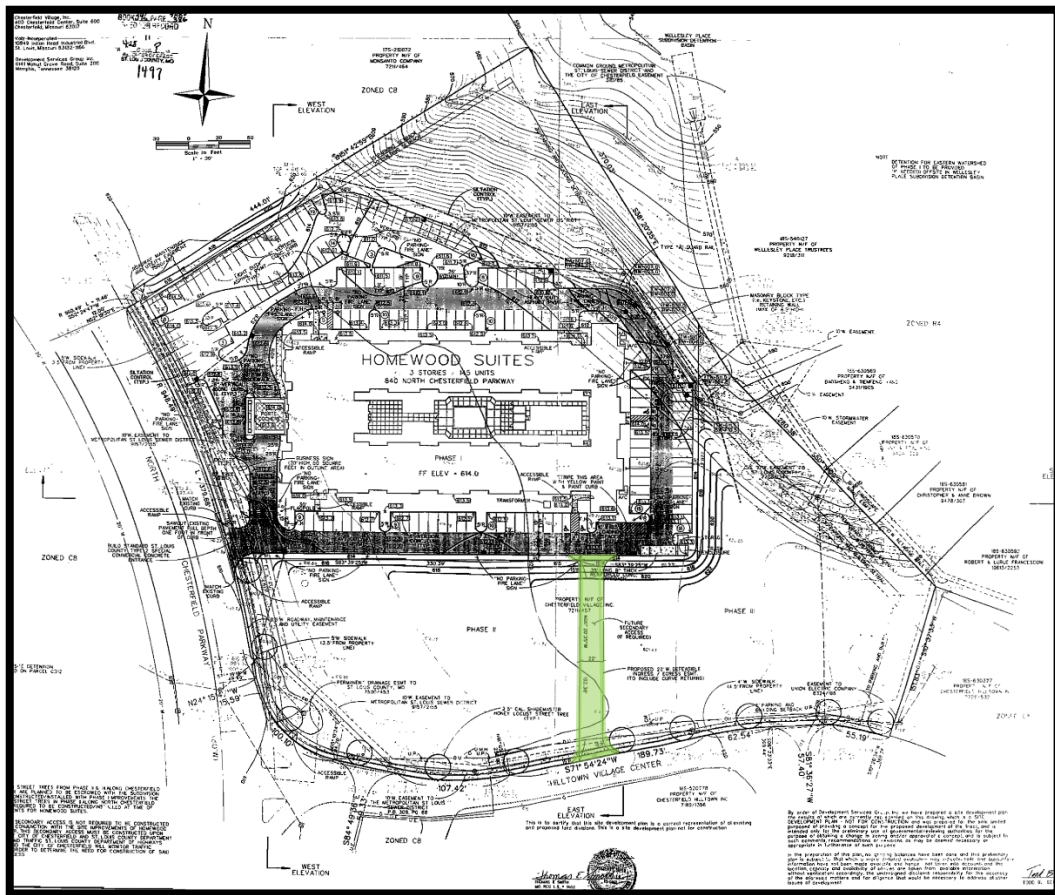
Homewood Suites Site Development Section Plan with easement in green
